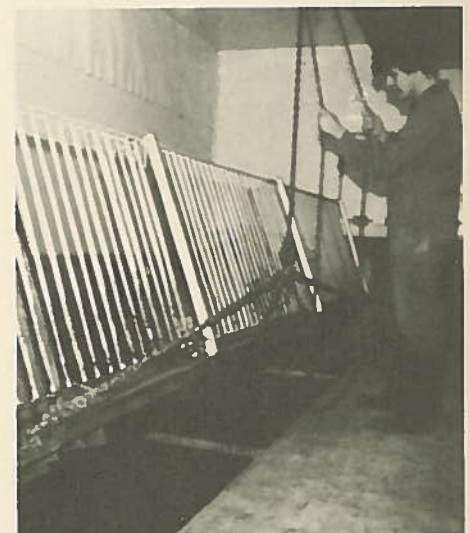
The "Swine Nursery Design Bulletin" outlines construction plans and instructions for operating nursery systems. Thorough cleaning of nursery pens is made easier with a tilting pen floor which can be winched into position to allow access to a manure trench.
